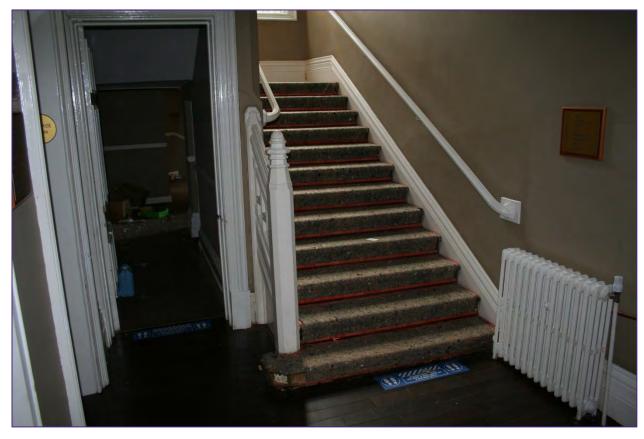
Base of the principal stairs with under stairs corridor to the smoking room.
